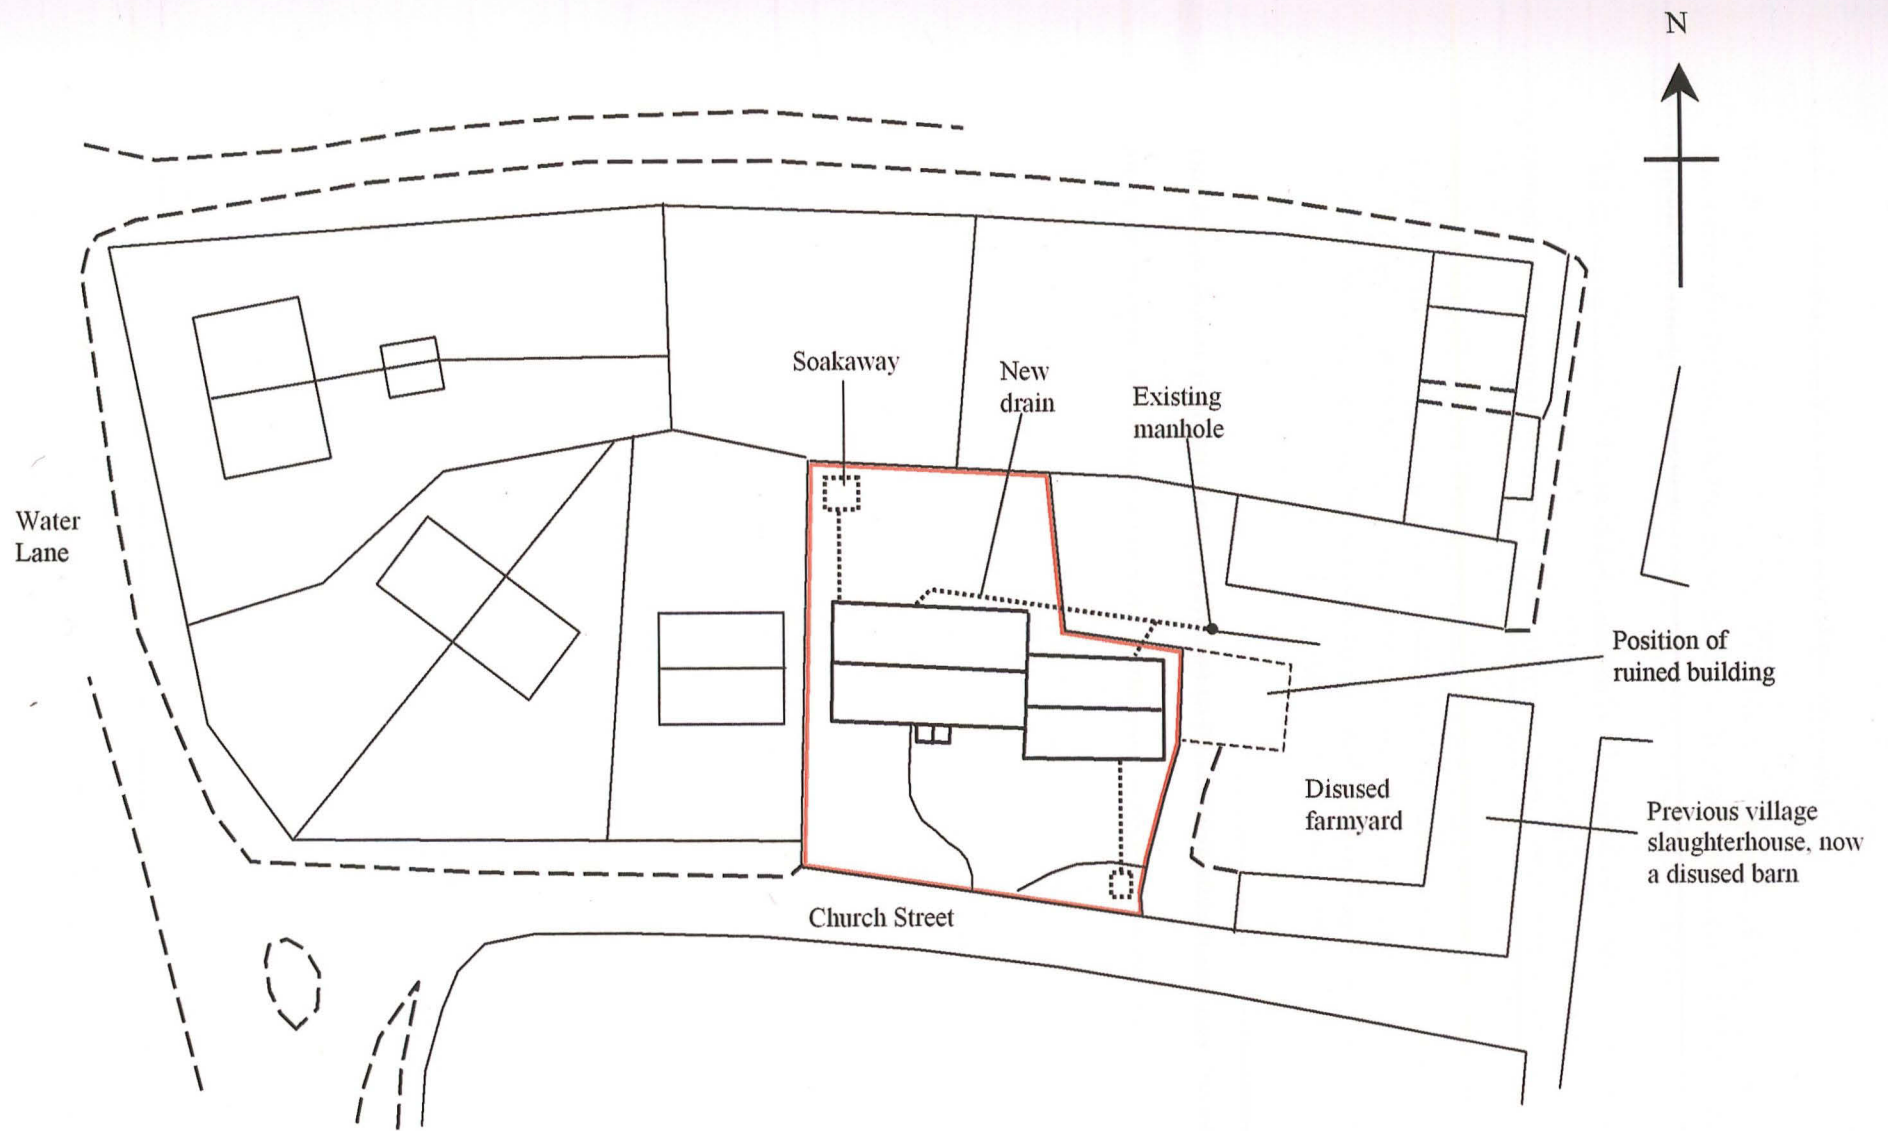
Plan of the development site (outlined in red) and surrounding area at scale 1:500, based on a plan supplied by the developer.
